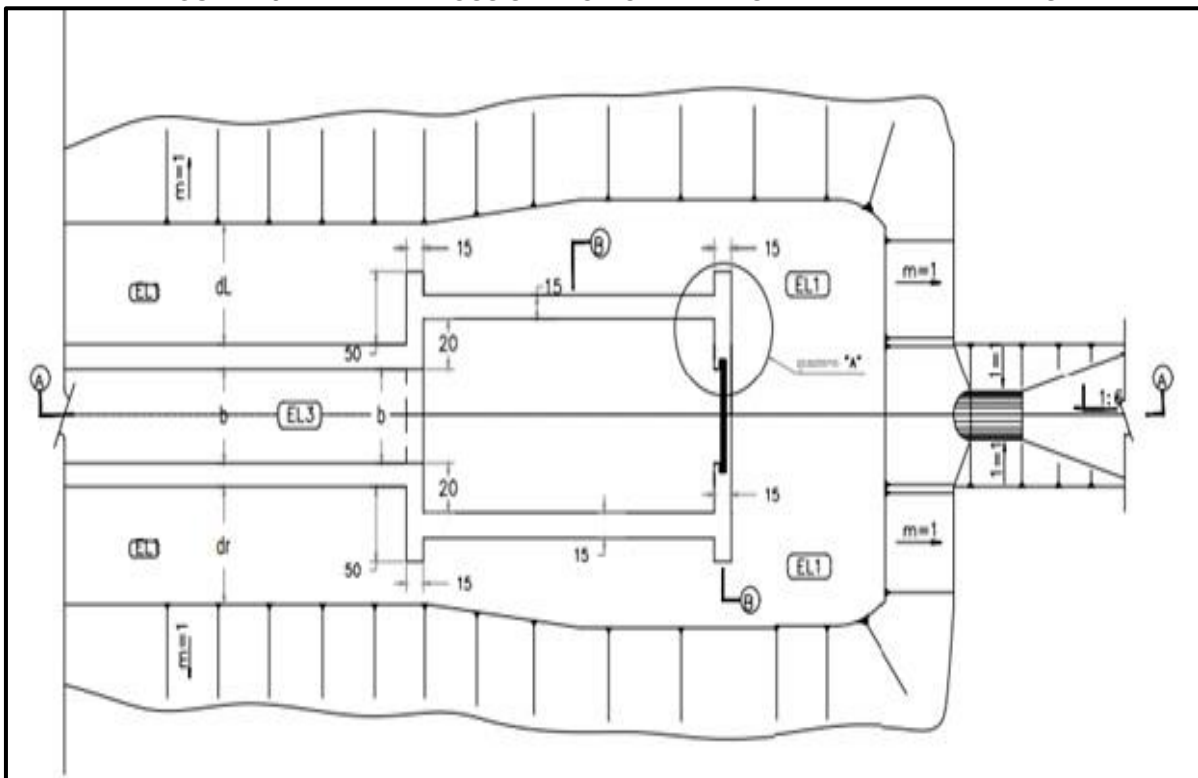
TYPICAL CROSS SECTION OF CANALS AND CANAL ELEMENTS
